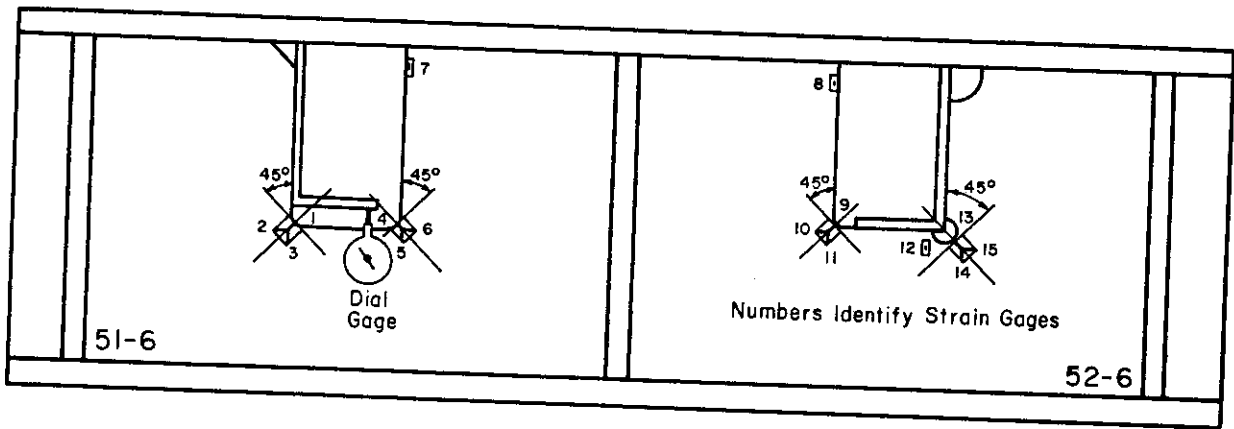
Strain Gage Locations, Specimen 51-6 and 52-6.
